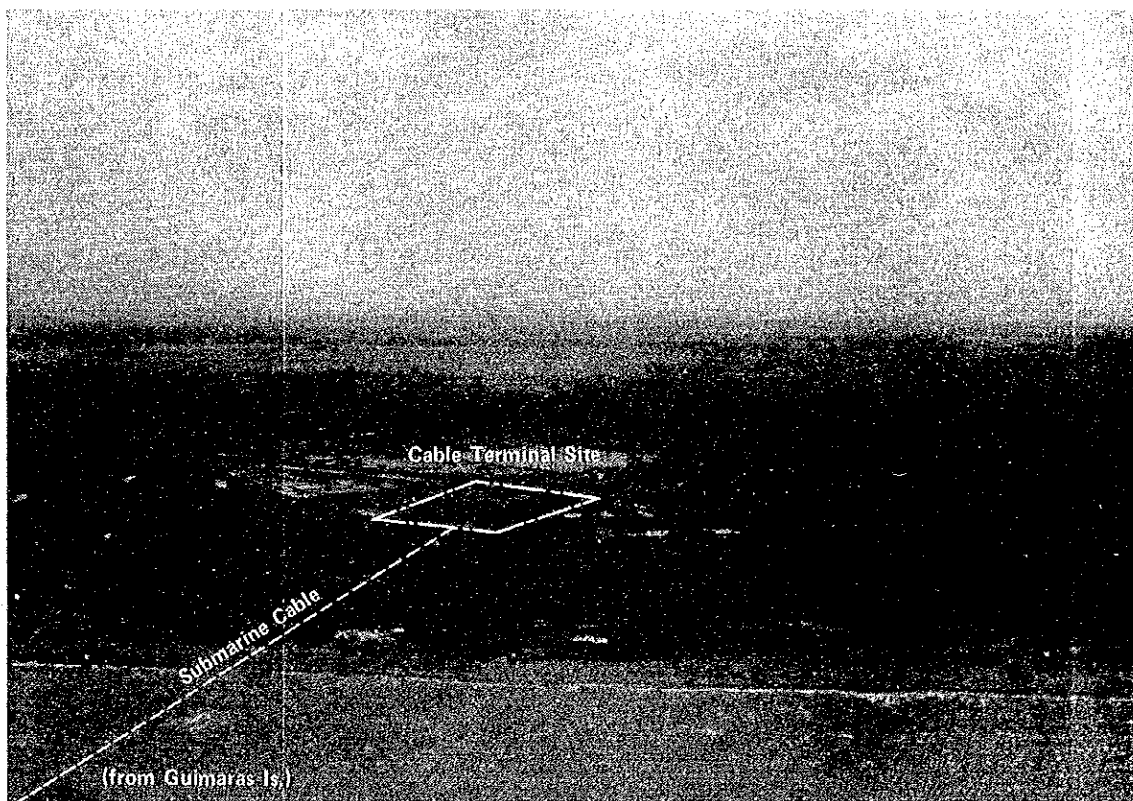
(2) Submarine Cable Route in the Guimaras Strait
